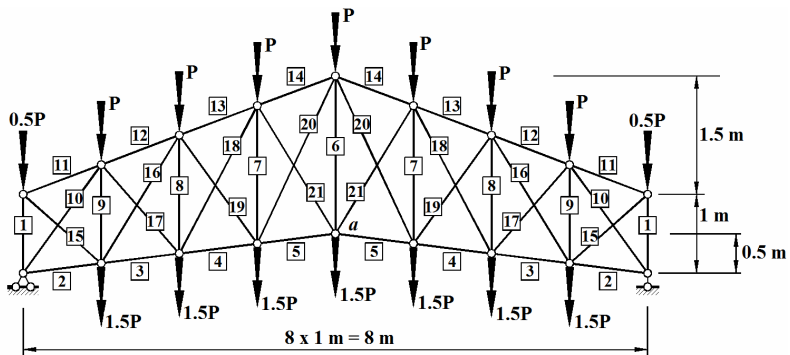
Design scheme of the 41-bar roof truss with stiffness types numbers
